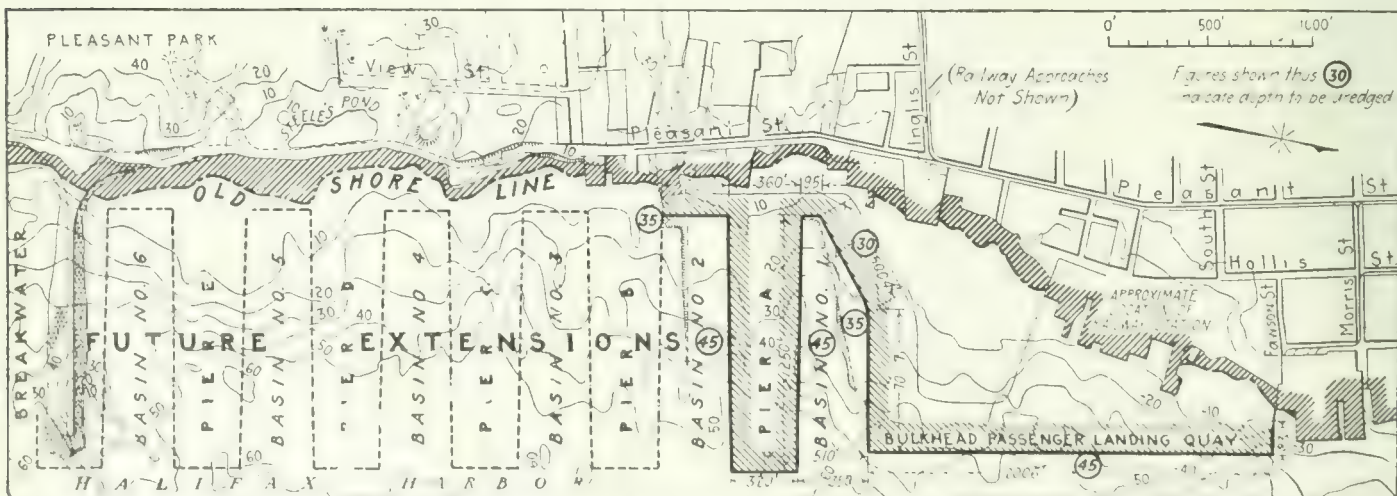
Layout of Quay and Piers and Location of Railway Terminal at Halifax. (Drawing by courtesy Engineering News.)
